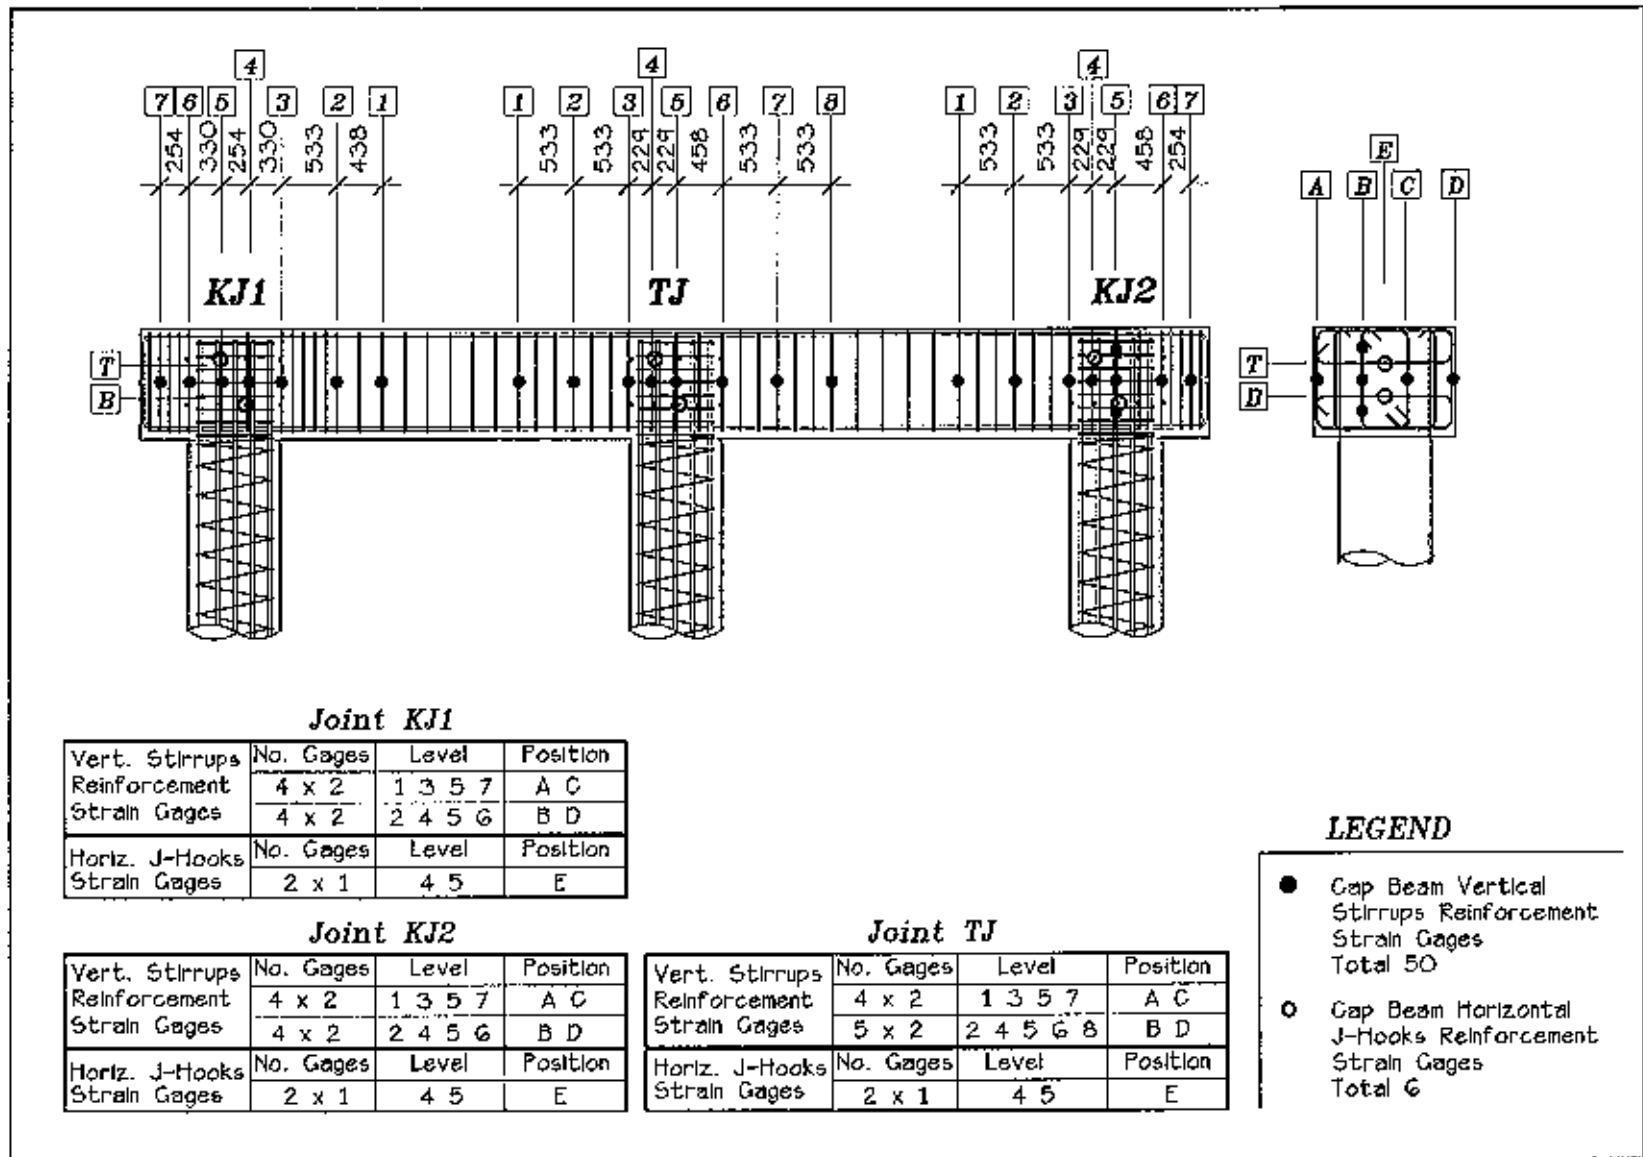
Cap Beam Stirrups Strain Gage Layout
